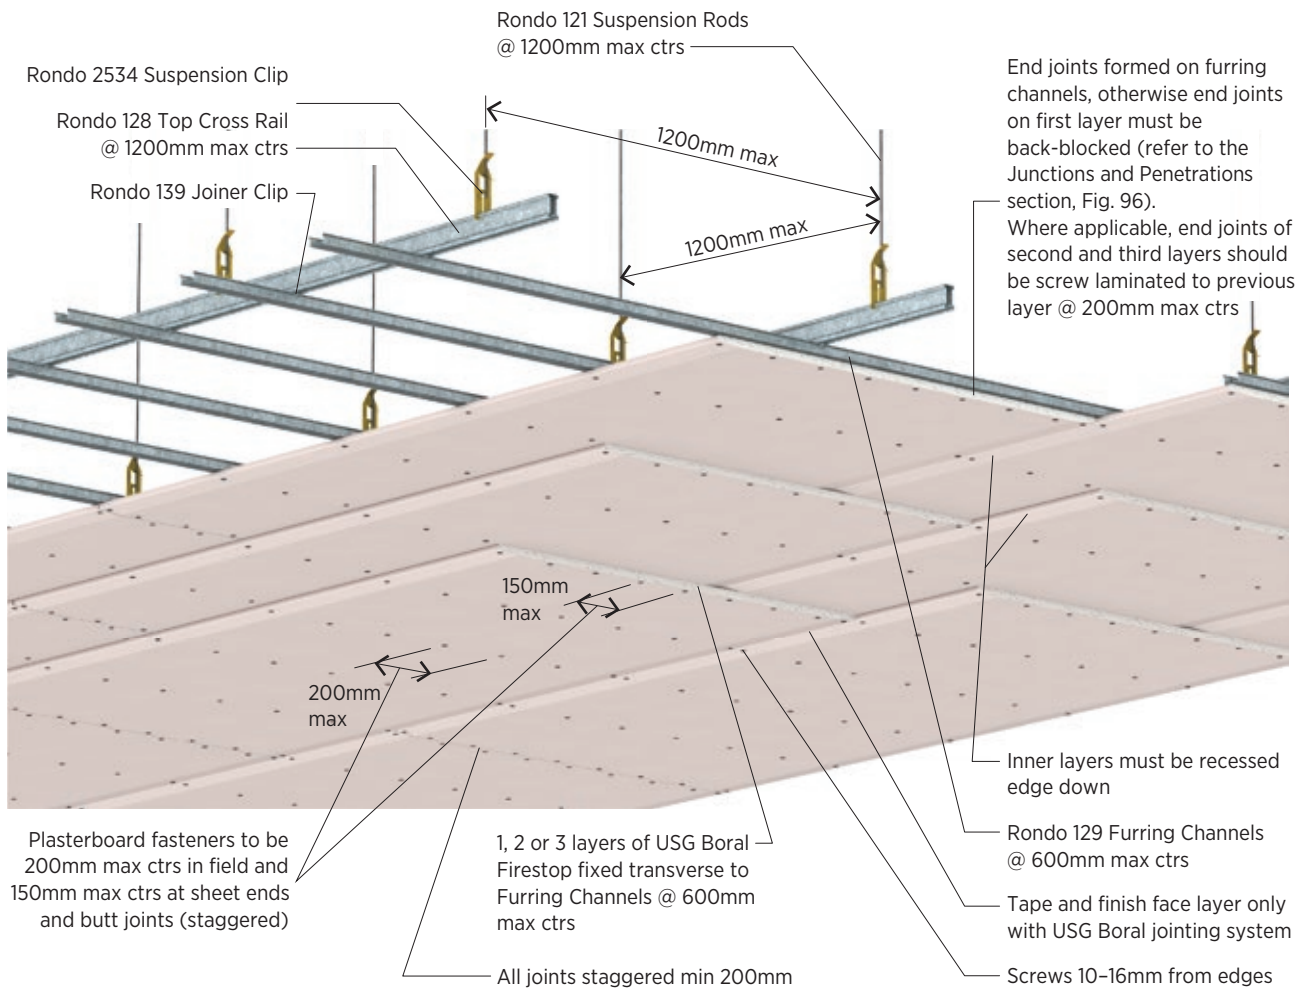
Fire-rated Ceiling – Screw-fixing Layout
